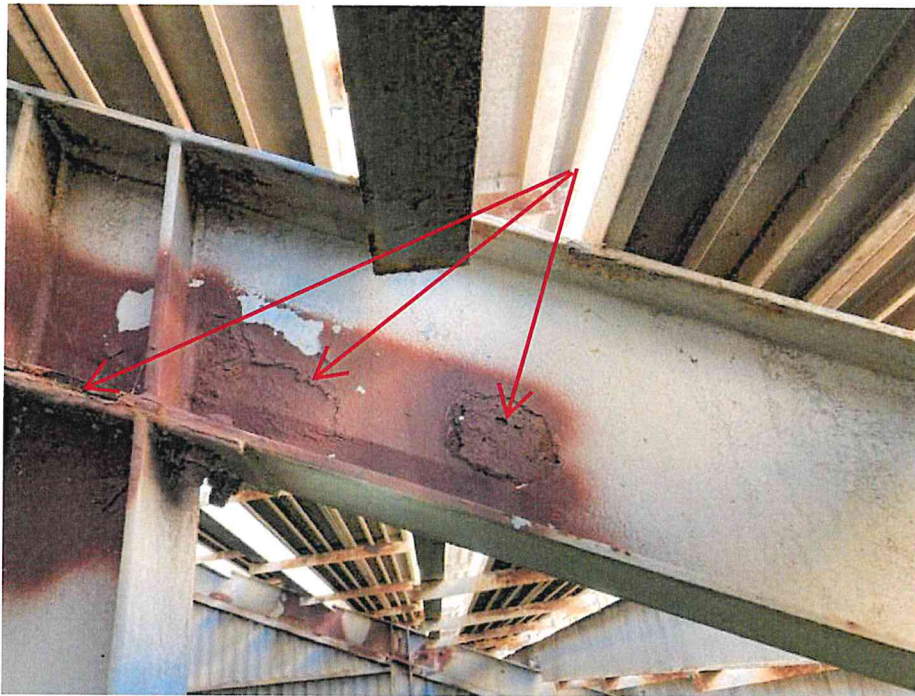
Photo showing severe corrosion at column web & flange, column top plate, and steel beam web & flange (indicated by red arrows)
